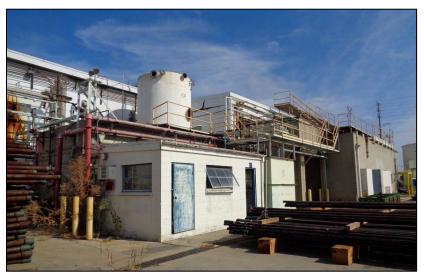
South elevation, Cold Storage portion of the facility, camera facing northeast. ICF, 2018.
